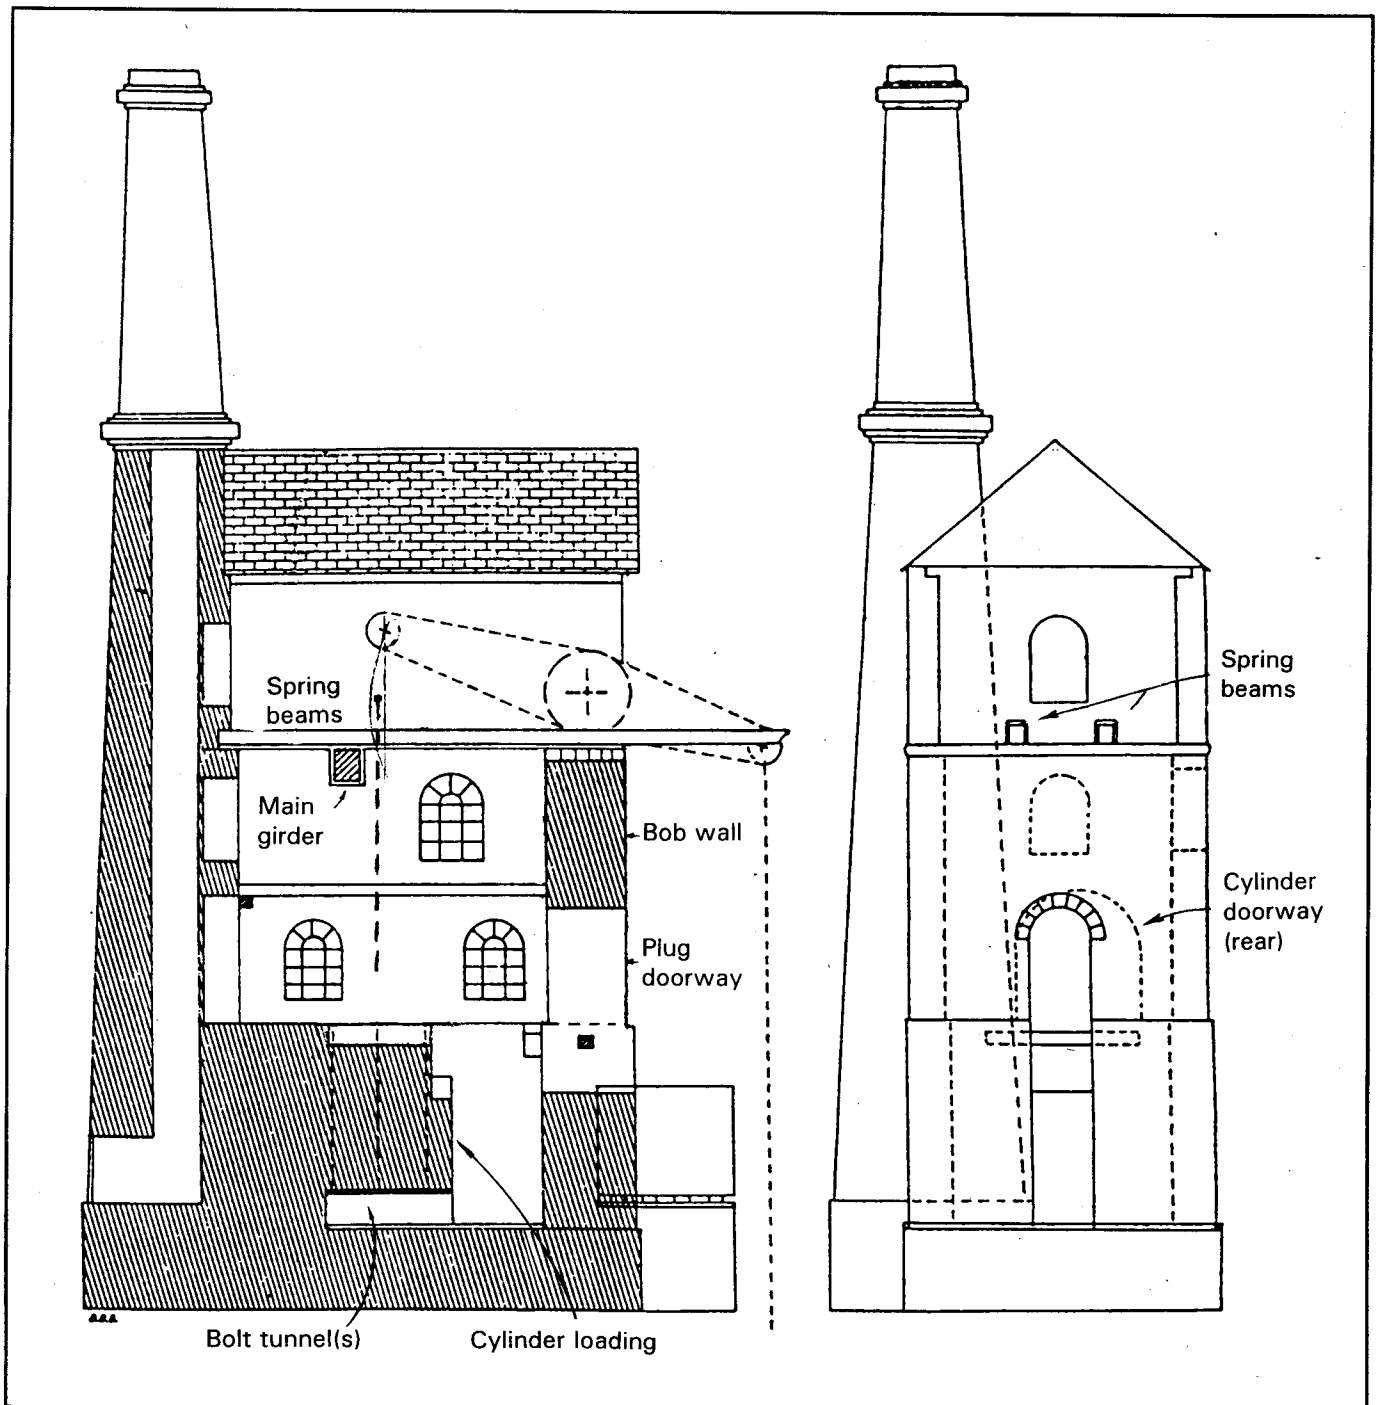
Section through a typical pumping engine house and shaft elevation.
